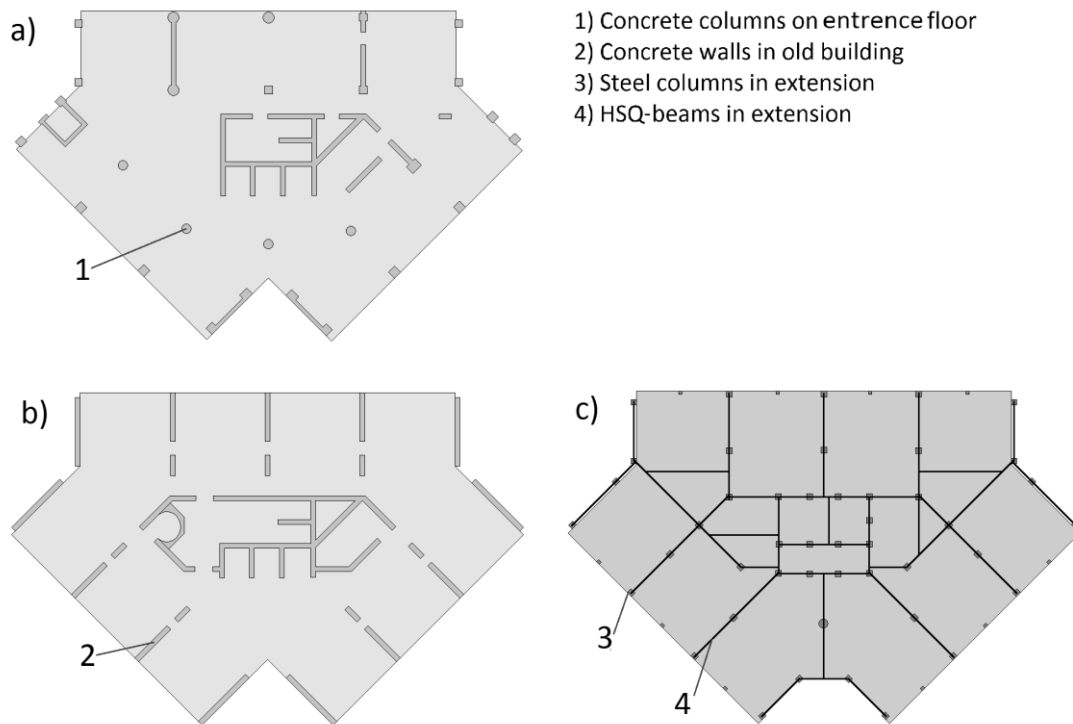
Structural system of Gothia Central Tower, a) entrance floor, b) upper storey in old building, c) storey in the extension.
